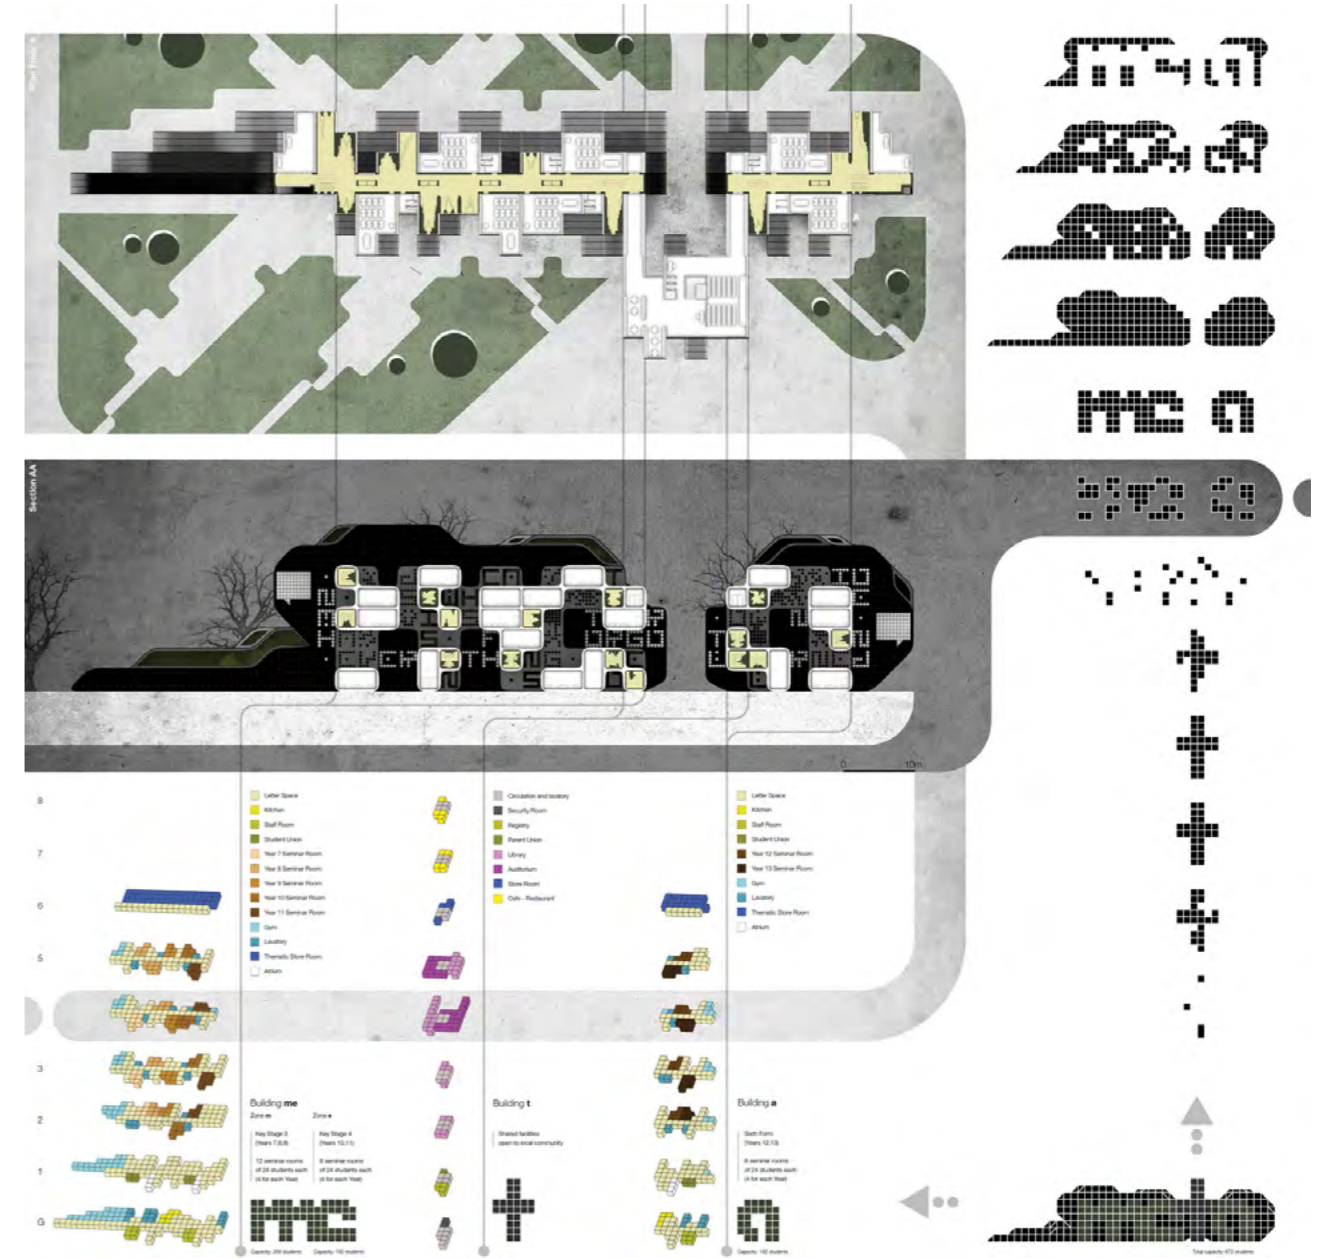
Metropoliian Academy, 4th floor plan, sections and distribution of programme
